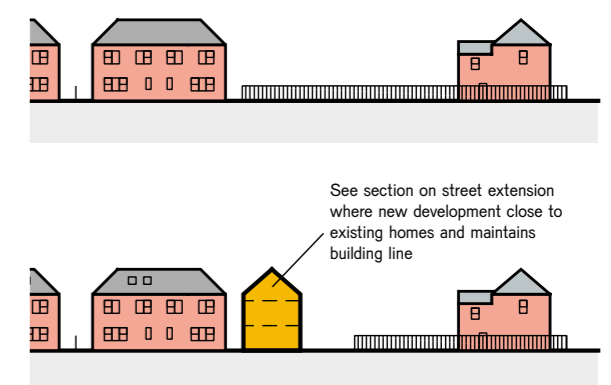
Example of street extension where new dwelling adopts building line of immediate neighbour and building line of existing street is maintained.
